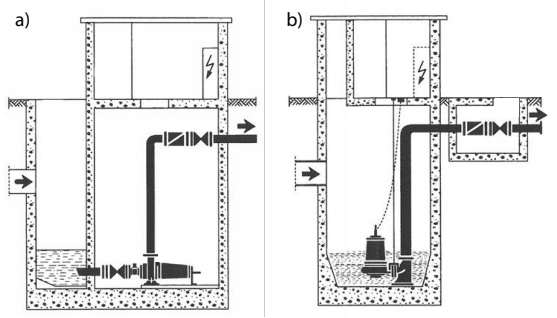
Wastewater pumping station with a) dry-installed and b) wet-installed pumps [7]
